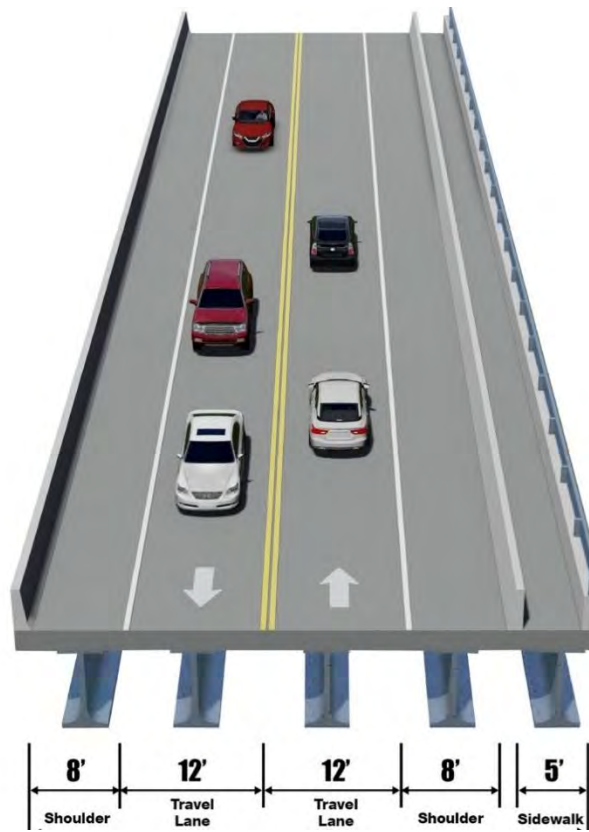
Existing Fort Hamer Bridge Typical Section
